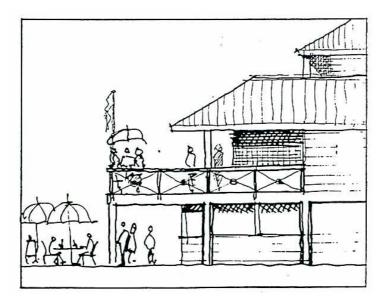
Roof pitch – Roofs shall be between 15° and 35° pitch. No flat roofs will be permitted
